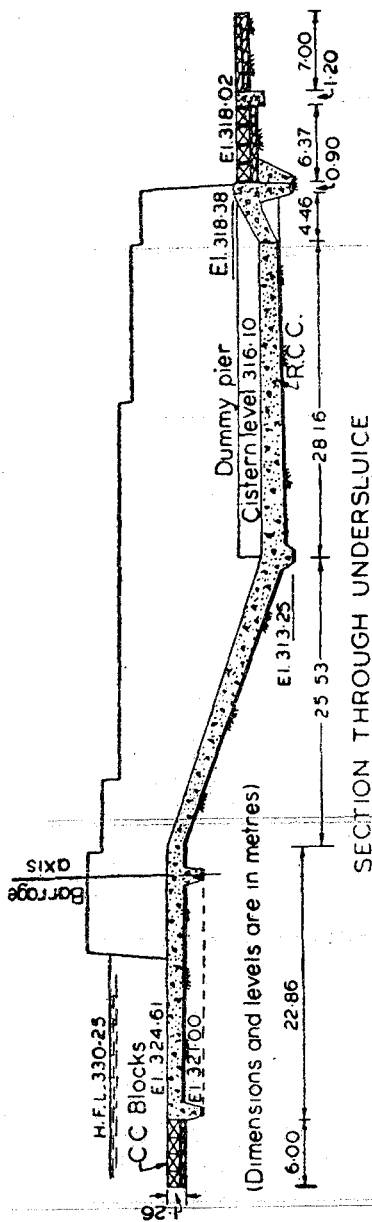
(c) Section through Under-sluice bays of Shah Nehar Barrage
